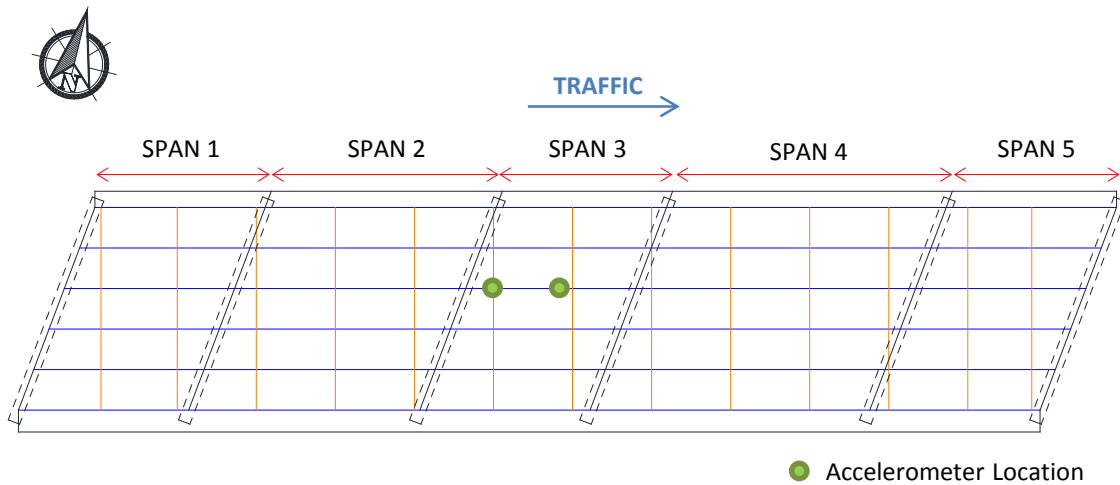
Plan view of the TX-71E Bridge showing accelerometer locations.
